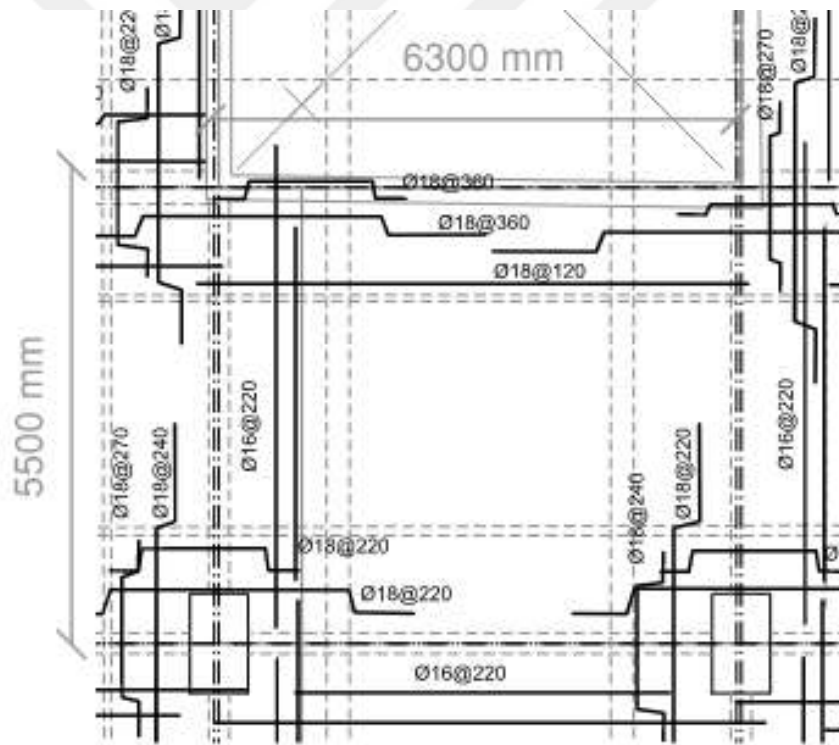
Column Strip Steel Reinforcement for Panel (6.3x5.5) of Flat Floor (6.3-5.5-5.2).
